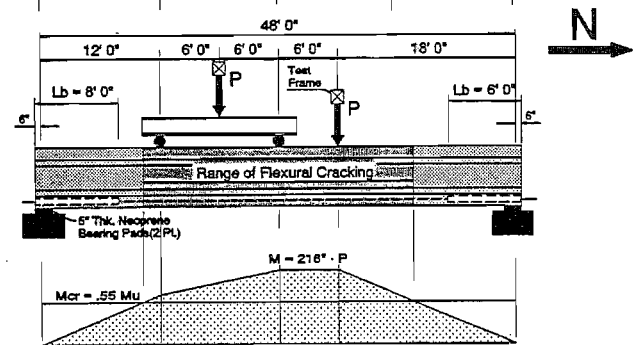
Test Setup and Dimensions for Full Sized Girder Tests, DZ2450-1 and 2 and FZ2450-3
